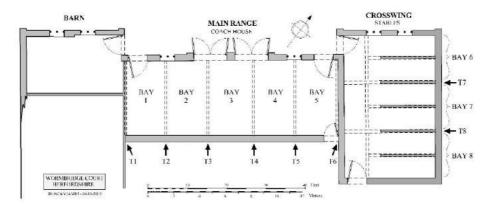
Ground plan of the coach house showing the primary layout of the main range with the roof truss positions T1-T6. This part of the building was a single storey with no internal sub-divisions. The three bays of the cross-wing stable range are shown with the interior sub-divided on the line of the ceiling beams to form six stalls
